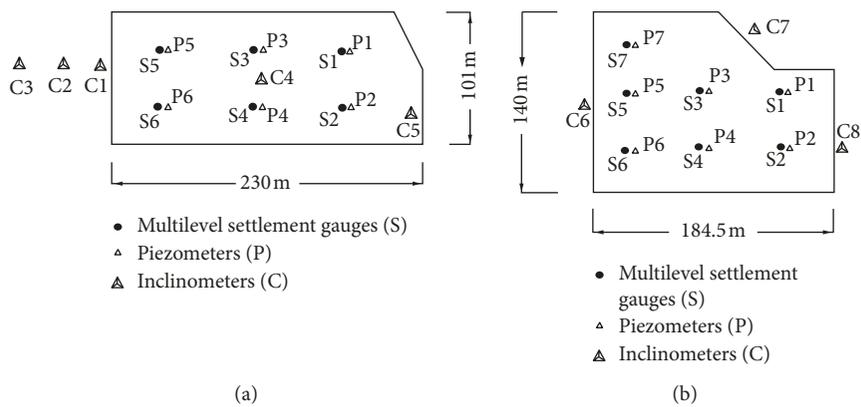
Plan views of the test equipment locations. (a) Section 1. (b) Section 2.
